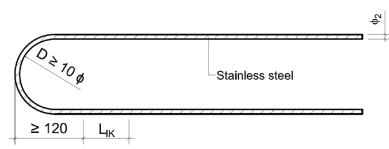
Tension bar for Schöck Isokorb® Type A and Type F
